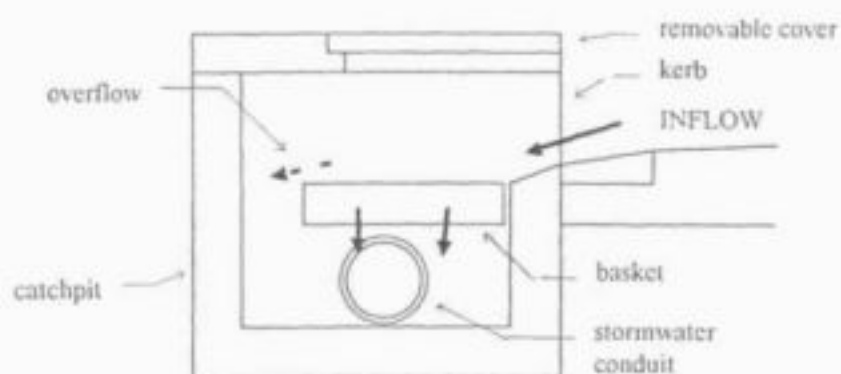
Cross-section through a typical side-entry catchpit trap
